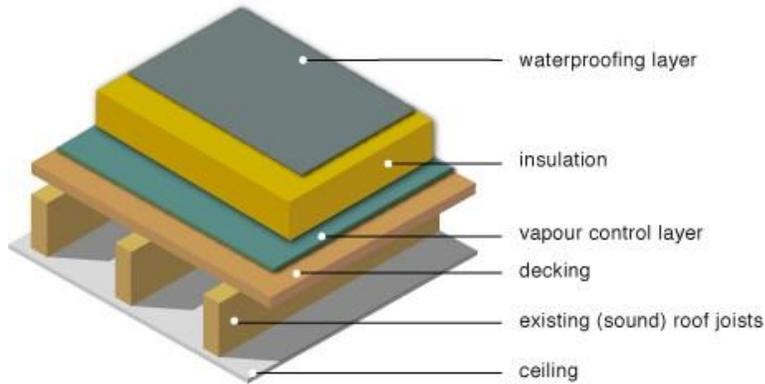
arm roof insulation (Source: www.greenspec.co.uk building design).
